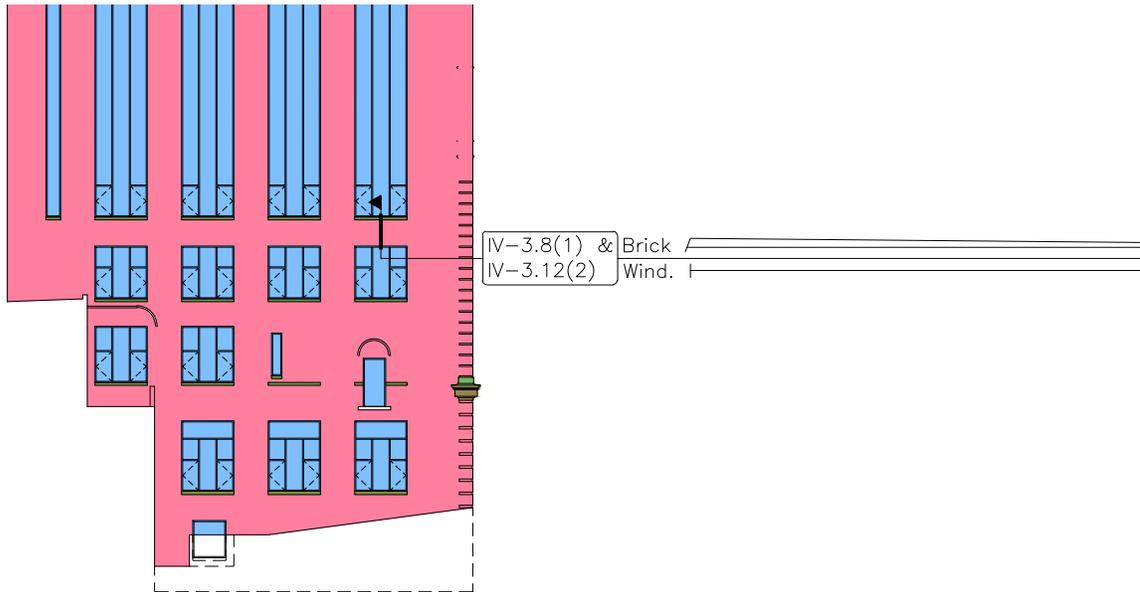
(6): North Courtyard: East-Facing Wall
